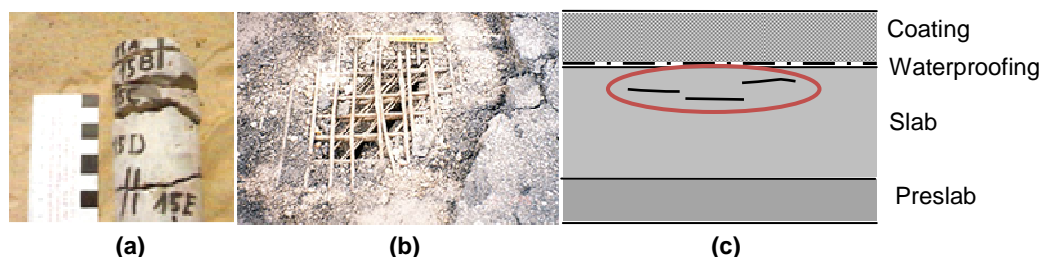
Bridge deck delaminations (Gilles 2004; Demars et al.)
